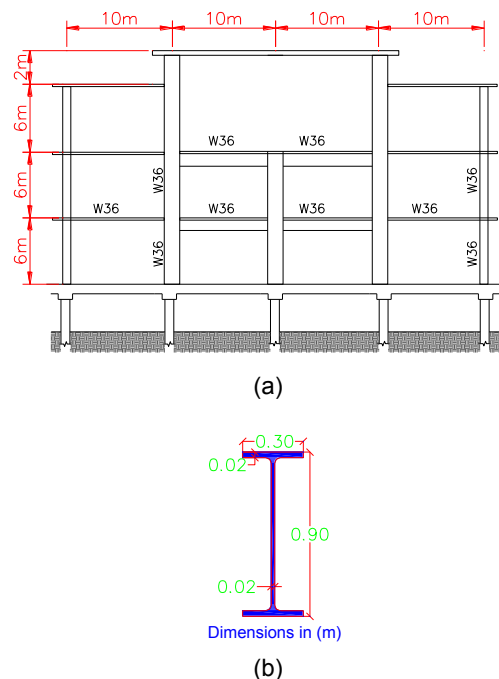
(a) Elevation view of building analyzed and (b) Cross section W36x135
